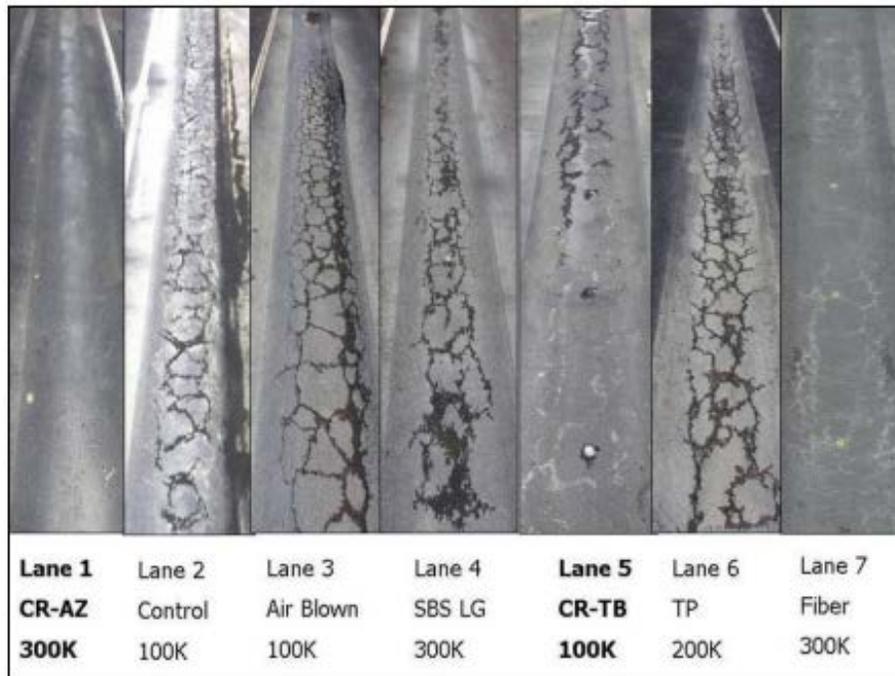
Sections Tested at the ALF (Source: [Takallou 2011])
